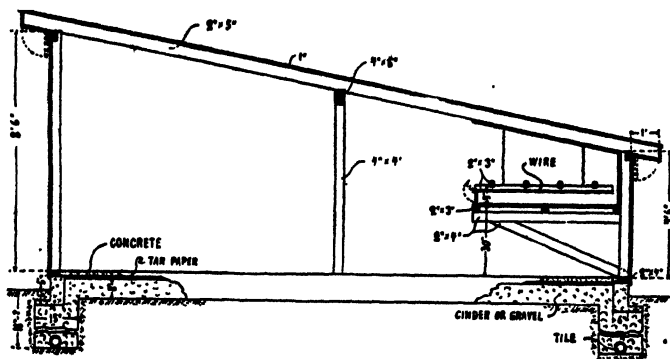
Cross-section through the center of a Cornell laying house 20 x 20.
